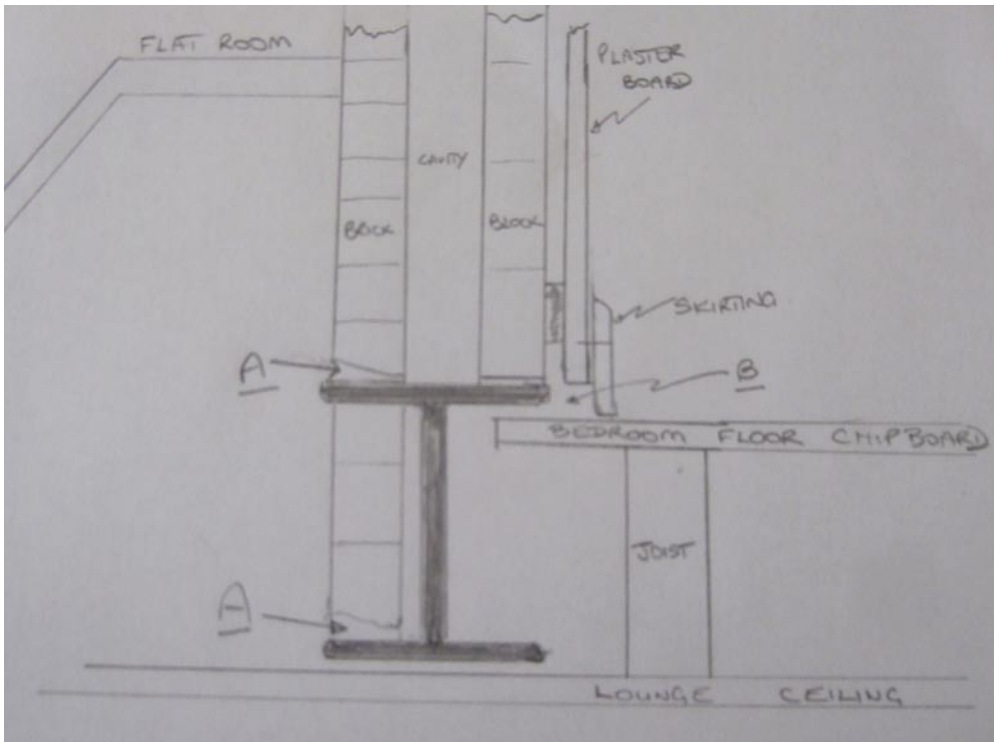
For this property extension a new RSJ had been installed between the extension roof and the existing lounge ceiling. Unfortunately the new 'ventilated' roof of the extension connected to the ceiling void of the lounge, which allowed for the unhindered movement of cold air from the loft to the rest of the house.
